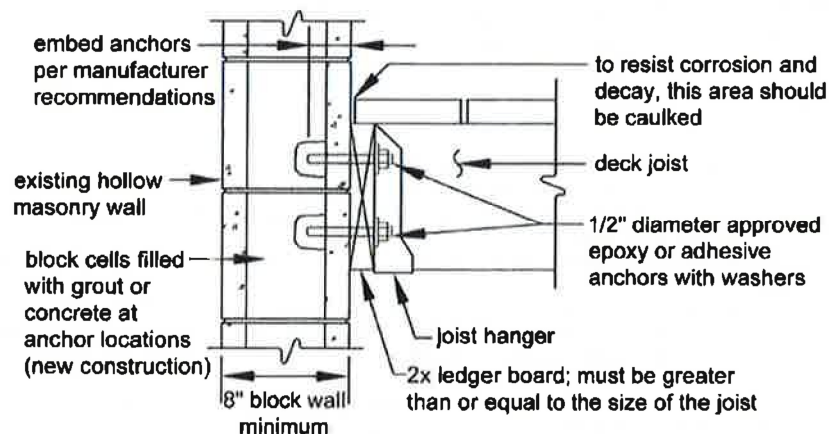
Attachment of Ledger Board to Foundation Wall (Hollow Masonry)
